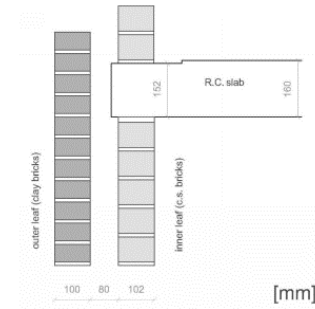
Detail of the connection between the r.c. slab of the first and second floor and the inner leaf (c.s. walls) - South side.
